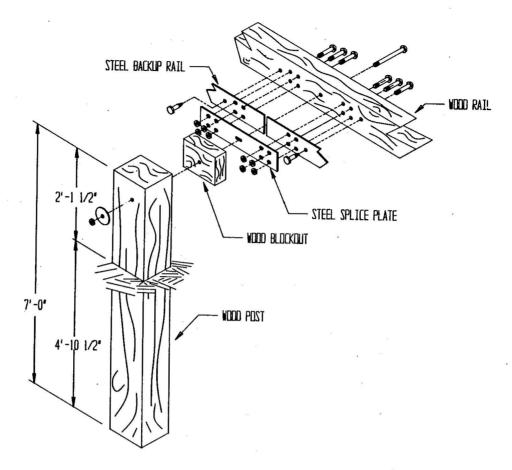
Blocked-out Steel-Backed Timber Guardrail -- Exploded View.
